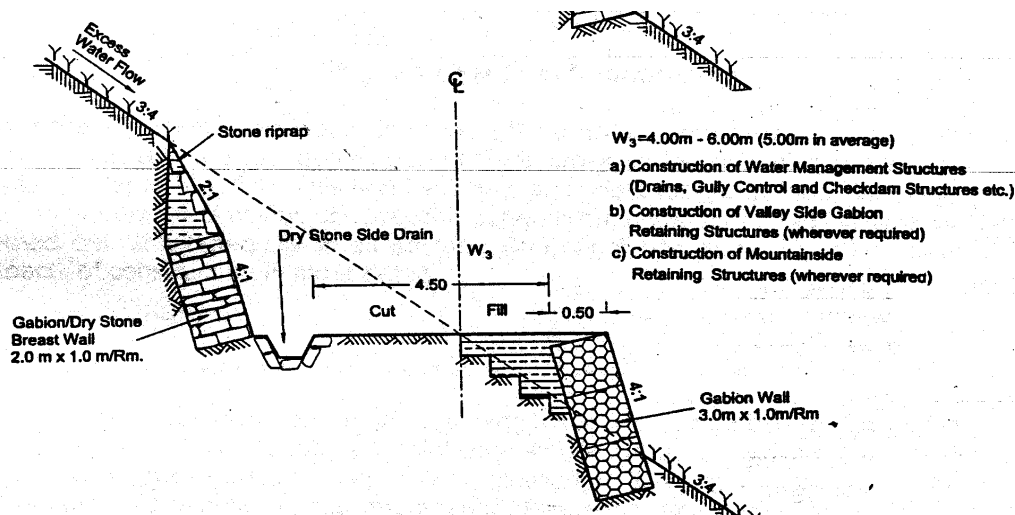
PHASE 3 – ROAD CONSTRUCTION IN SITUATION WITH EXCESS WATER FROM MOUNTAINSIDE
